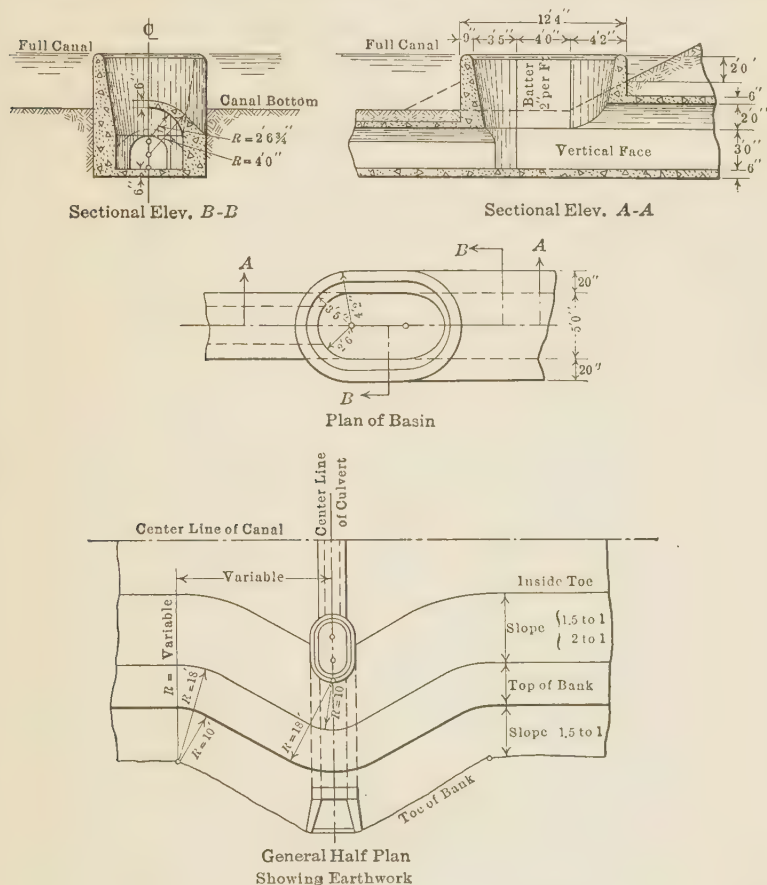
Combined overflow spillway and culvert. Belle Fourche Project, S. D.
